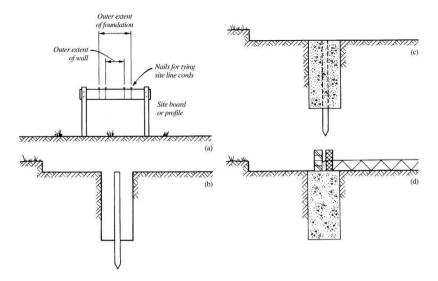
Foundation construction: (a) site board or profiles placed to establish position of future foundation (see Fig. 18.11); (b) the foundation is excavated and stakes are inserted to give a consistent level for the top surface; (c) the vertical or deep strip foundation is completed; (d) wall construction is begun just below natural ground level then hardcore is laid and consolidated.
